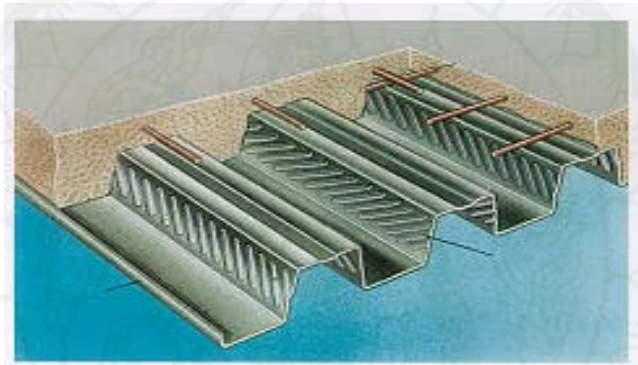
A Steel-concrete composite floor slab with profiled steel sheeting
